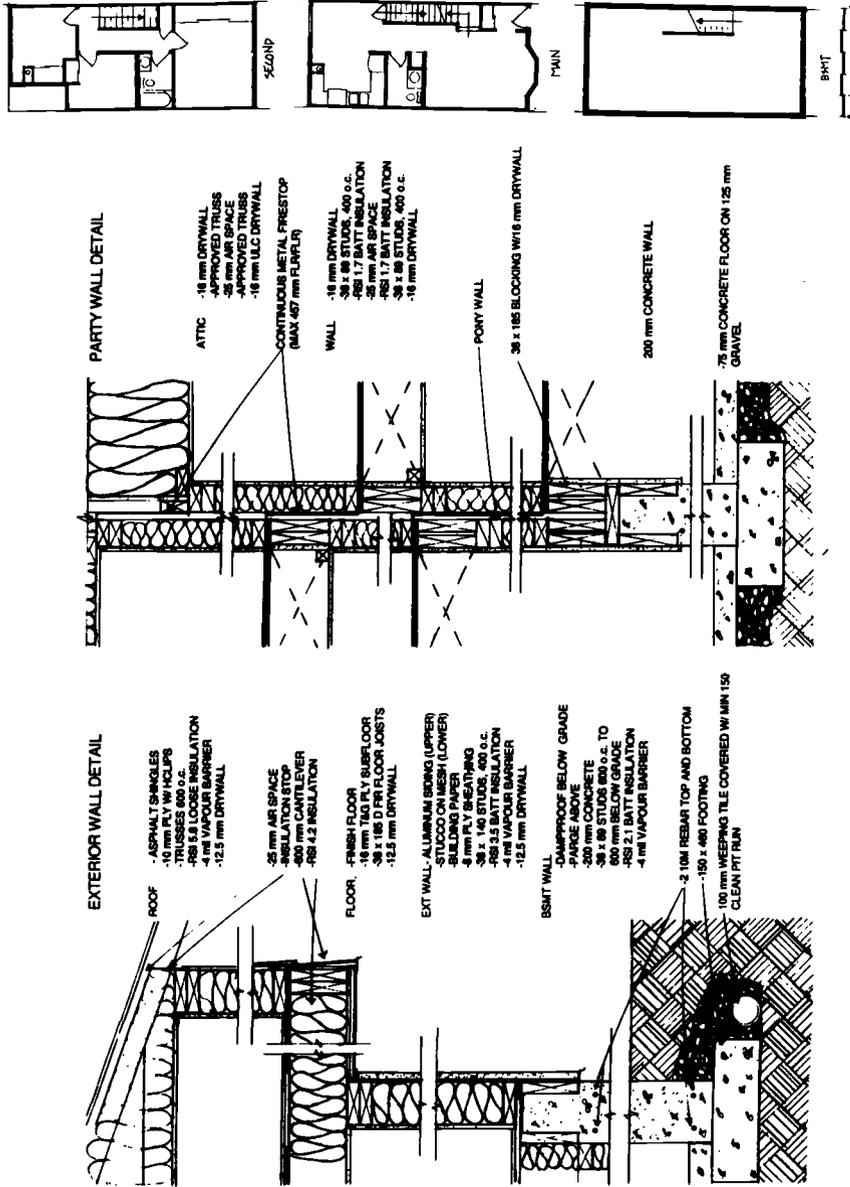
Exterior wall section, party wall section, and floor plans for Project 6.
